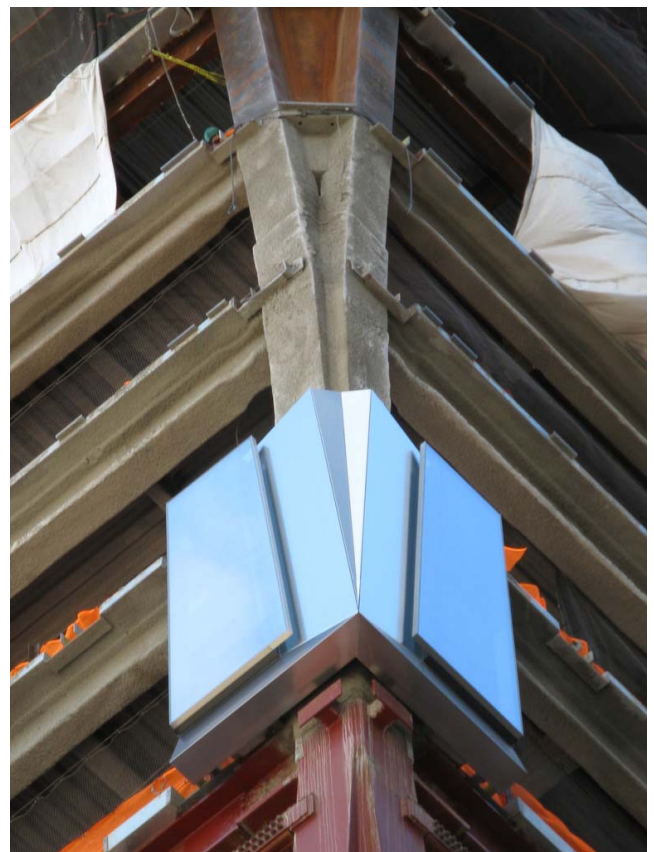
One World Trade Center Facade (Shapiro, 2010)
